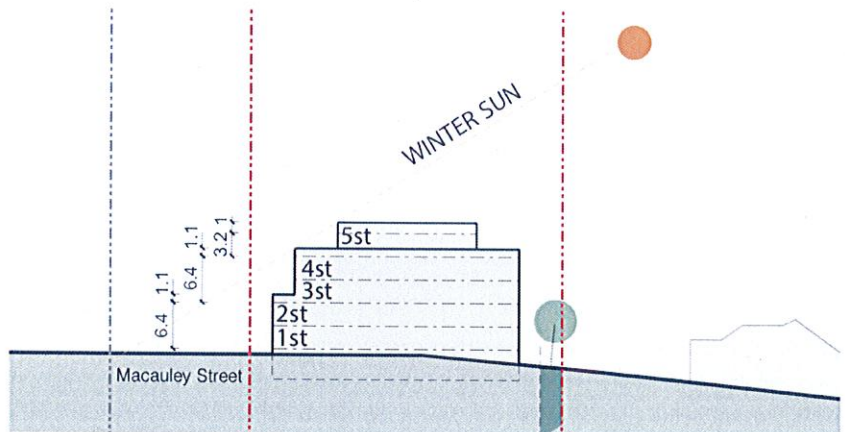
Marion Street _ Building envelope _ Section B-B
